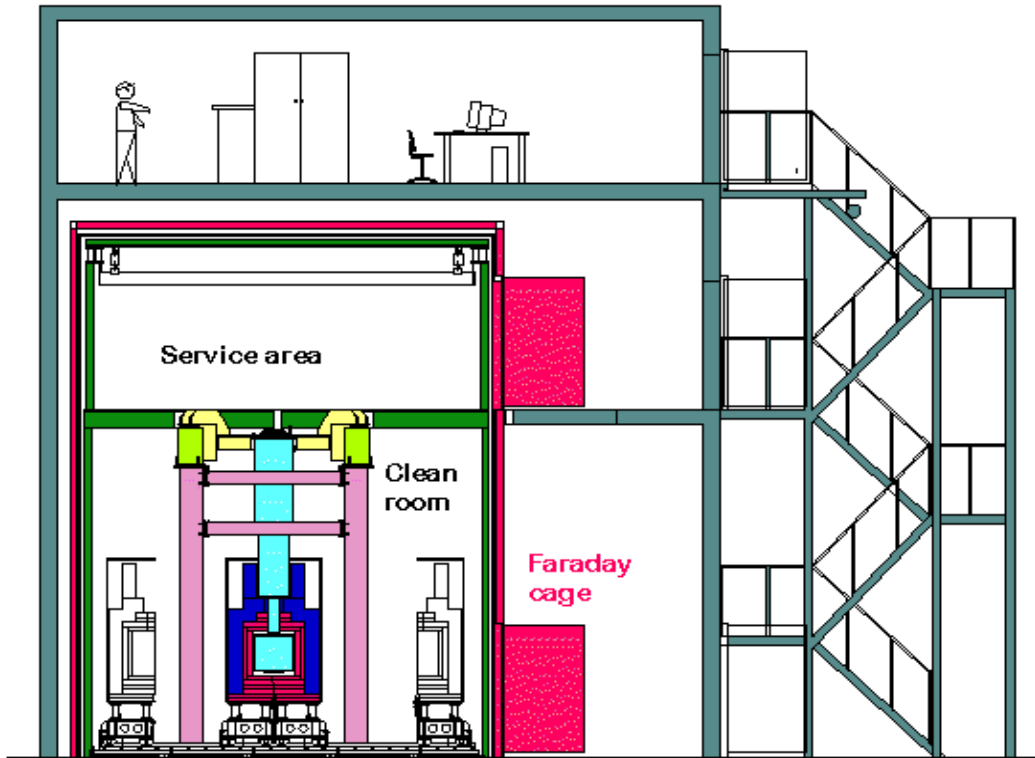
Schematic drawing of the three level CRESST building in hall B of the Gran Sasso Underground Laboratory.
